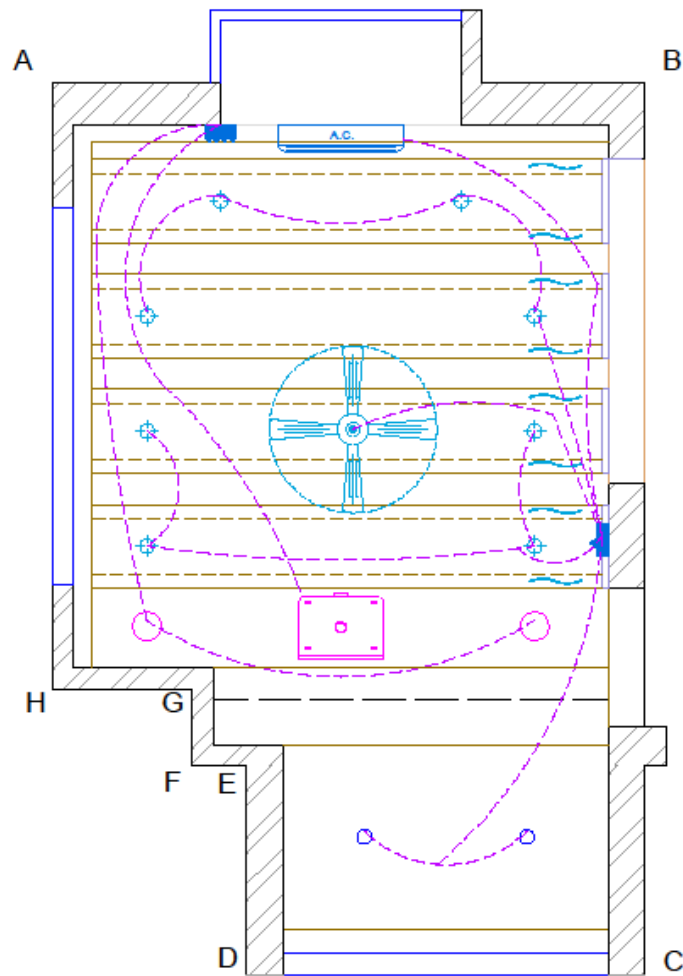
PROPOSED FALSE CEILING WORKING DRAWING (Option-2)
